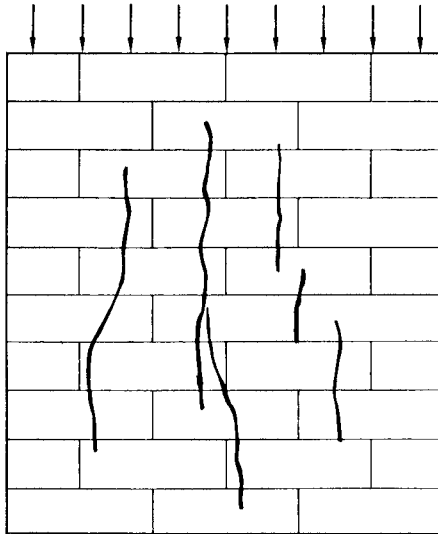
Typical failure pattern in a brickwork wall.
